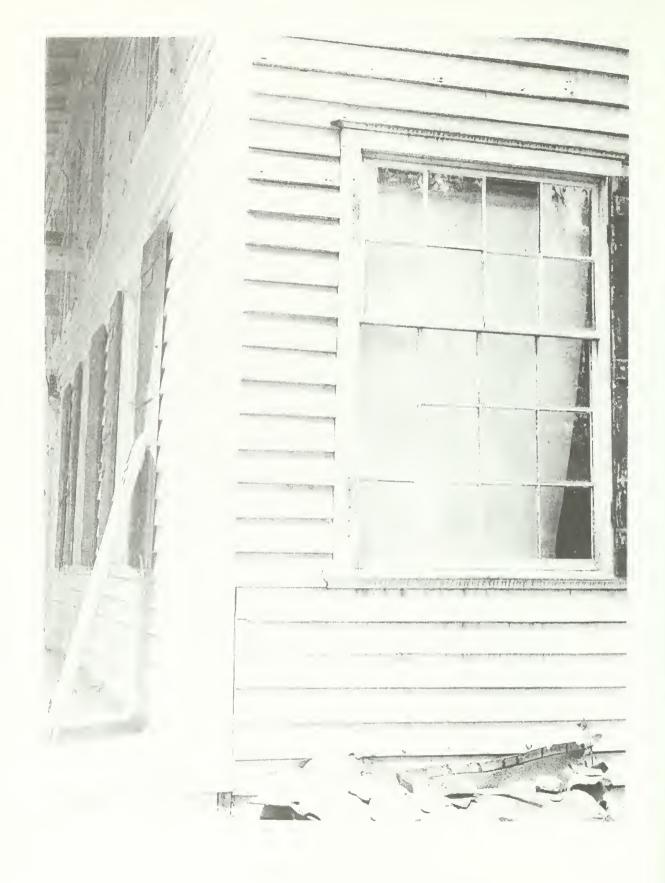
Schuyler House: Southwest corner (ca. 1956).
